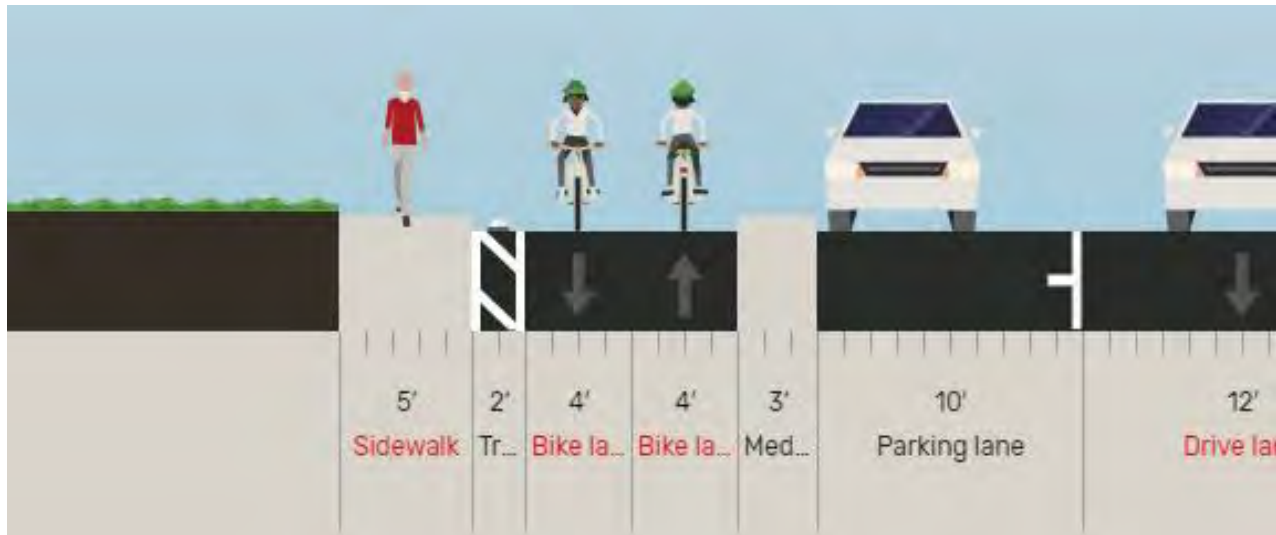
New Avenue Bikeway between Belford Place and Shopping Center line – Option 3
